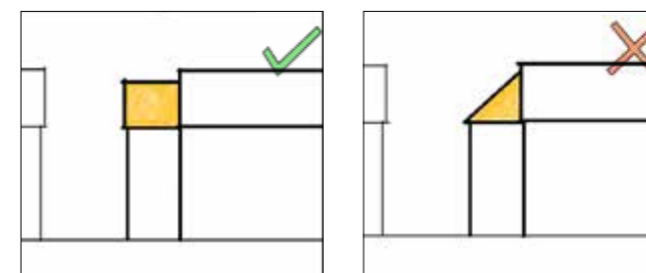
How to ensure that extensions adopt roof forms that match existing roof forms and pitches
